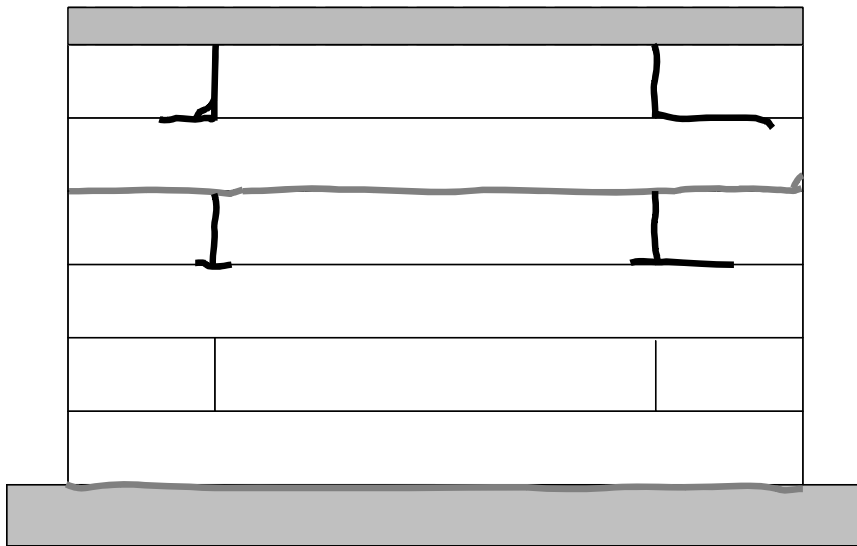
Cracking of Shear Wall Pilot Specimen 1 at Cycle 7 (vertical cracks along head joints)
